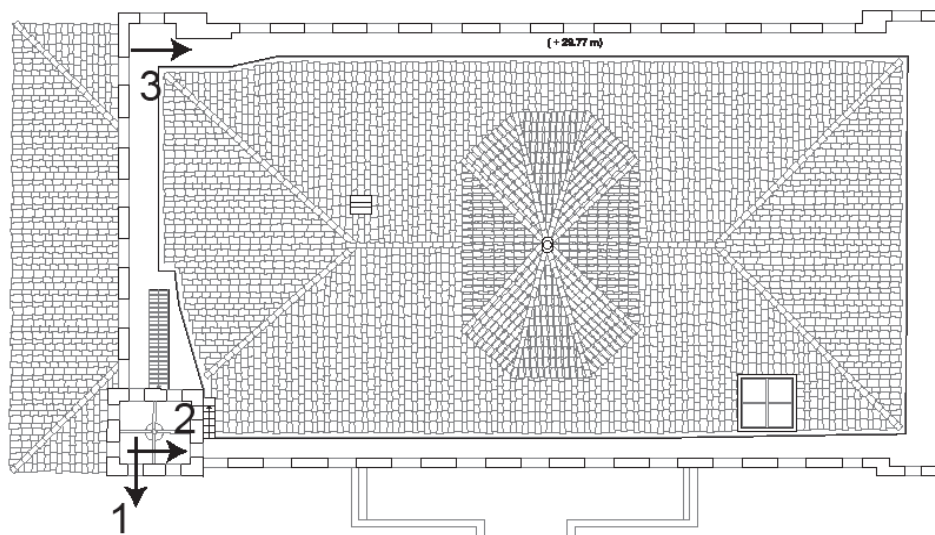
Installation layout of the three accelerometers at the roof level of Consoli Palace
